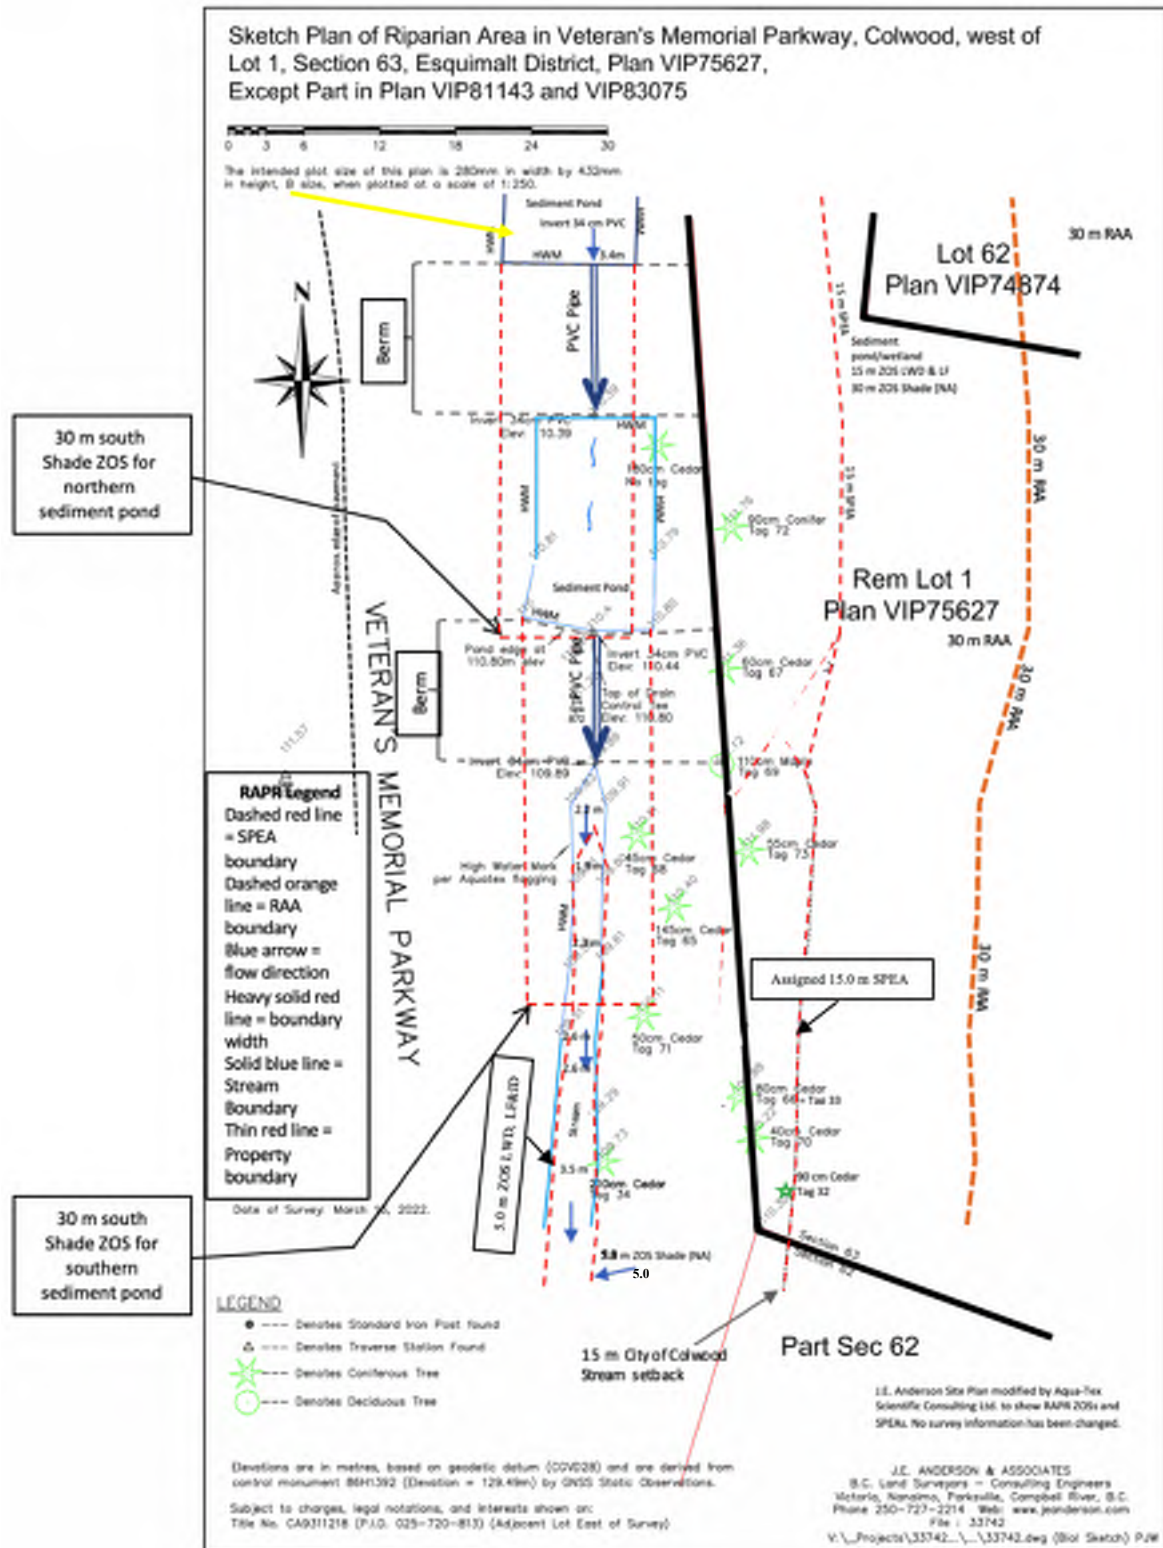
Site Plan of treatment ponds and stream (ditch) located west of the subject property (black line), lying within VMP road right-of-way. Yellow arrow = culvert under VMP (arrow added by Aqua-Tex to JEA drawing) discharging stormwater into the treatment pond (Figure 8). 15 m assigned SPEA line added by Aqua-Tex (redundant 5 m SPEA not shown).
